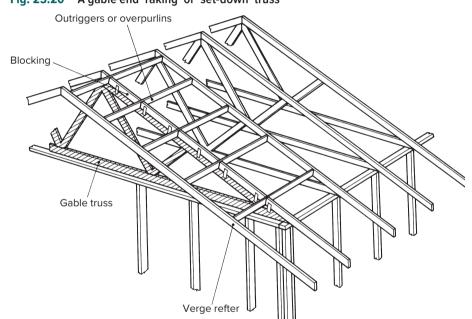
A gable end 'raking' or 'set-down' truss
